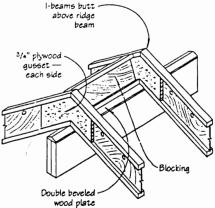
Roof Framing with Wood I-beam (Hock, 1990)
